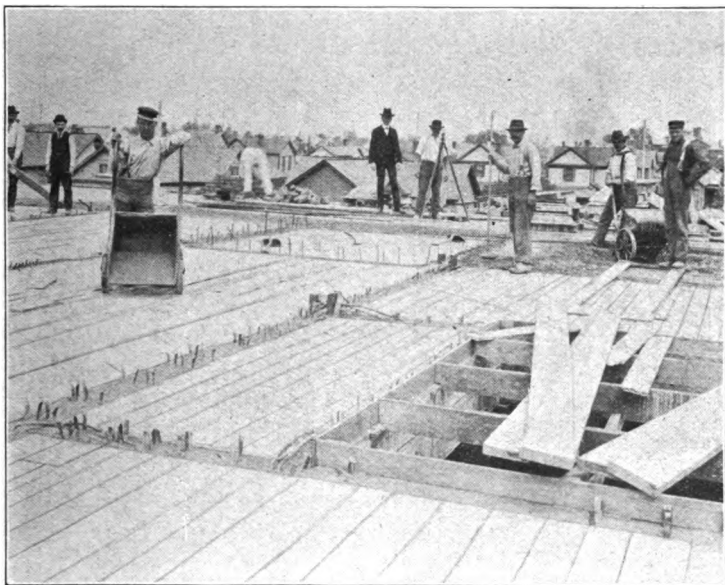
Concreting of Floors, Davis Sewing Machine Co.
